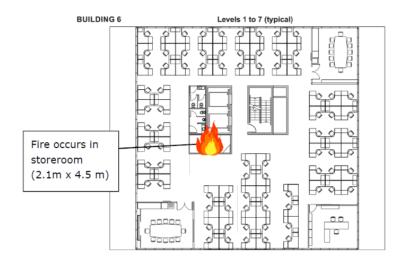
Location of the design fire on the office floor in the UT1 scenario. The fire is located in a storage room.
